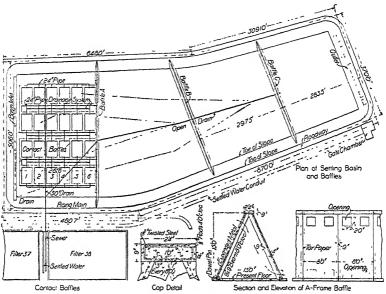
Plan of contact baffles and details of A-frame baffles at Pittsburgh filtration plant.
